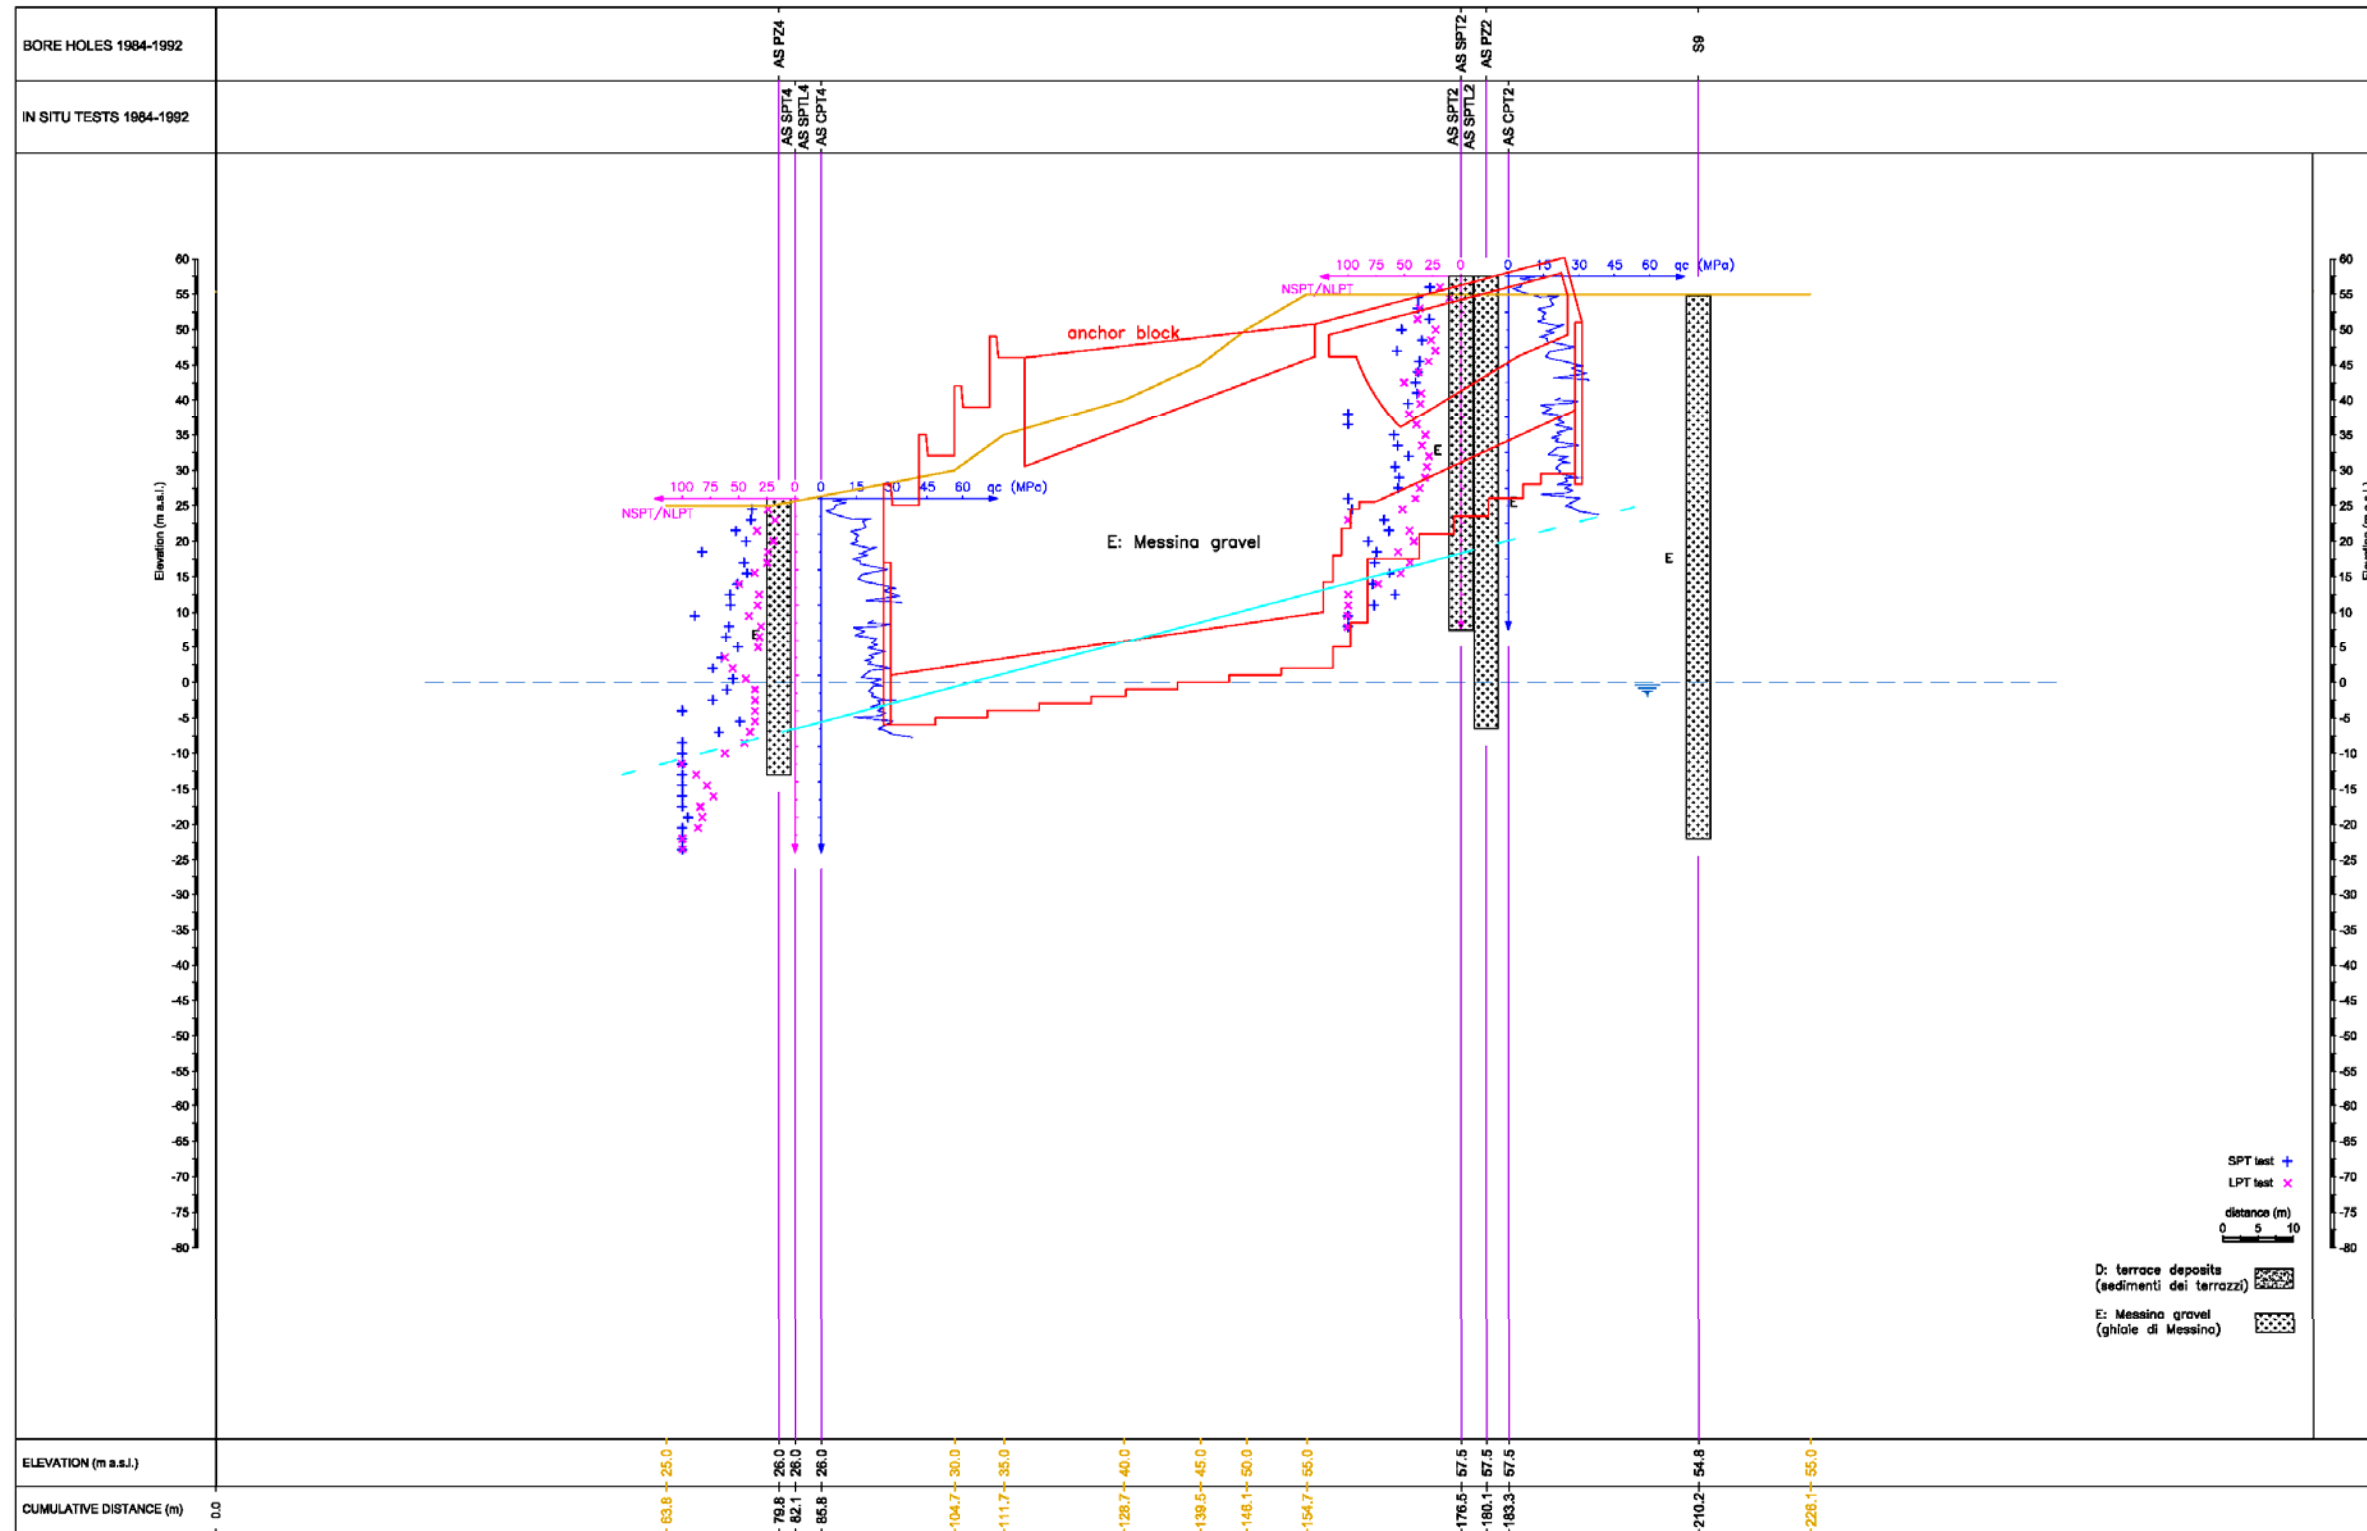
Sicily Anchor Block, longitudinal section (Section No. 2)
